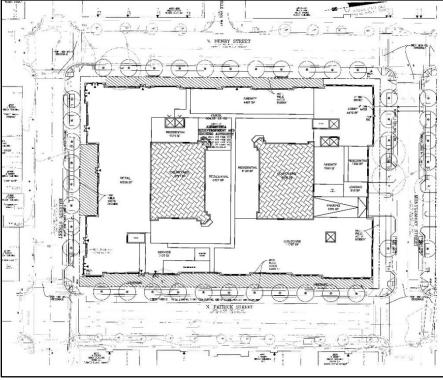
Proposed design plans for the North and South Buildings, respectively (plans provided by Bowman Consulting).
